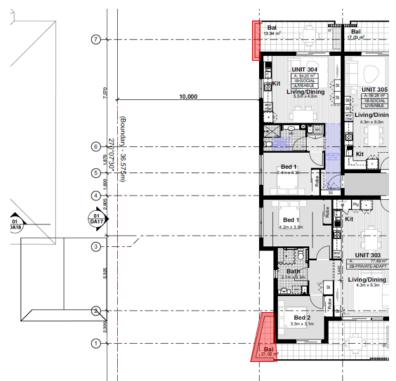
Proposed Balcony Returns to Be Deleted (Shaded Red)
